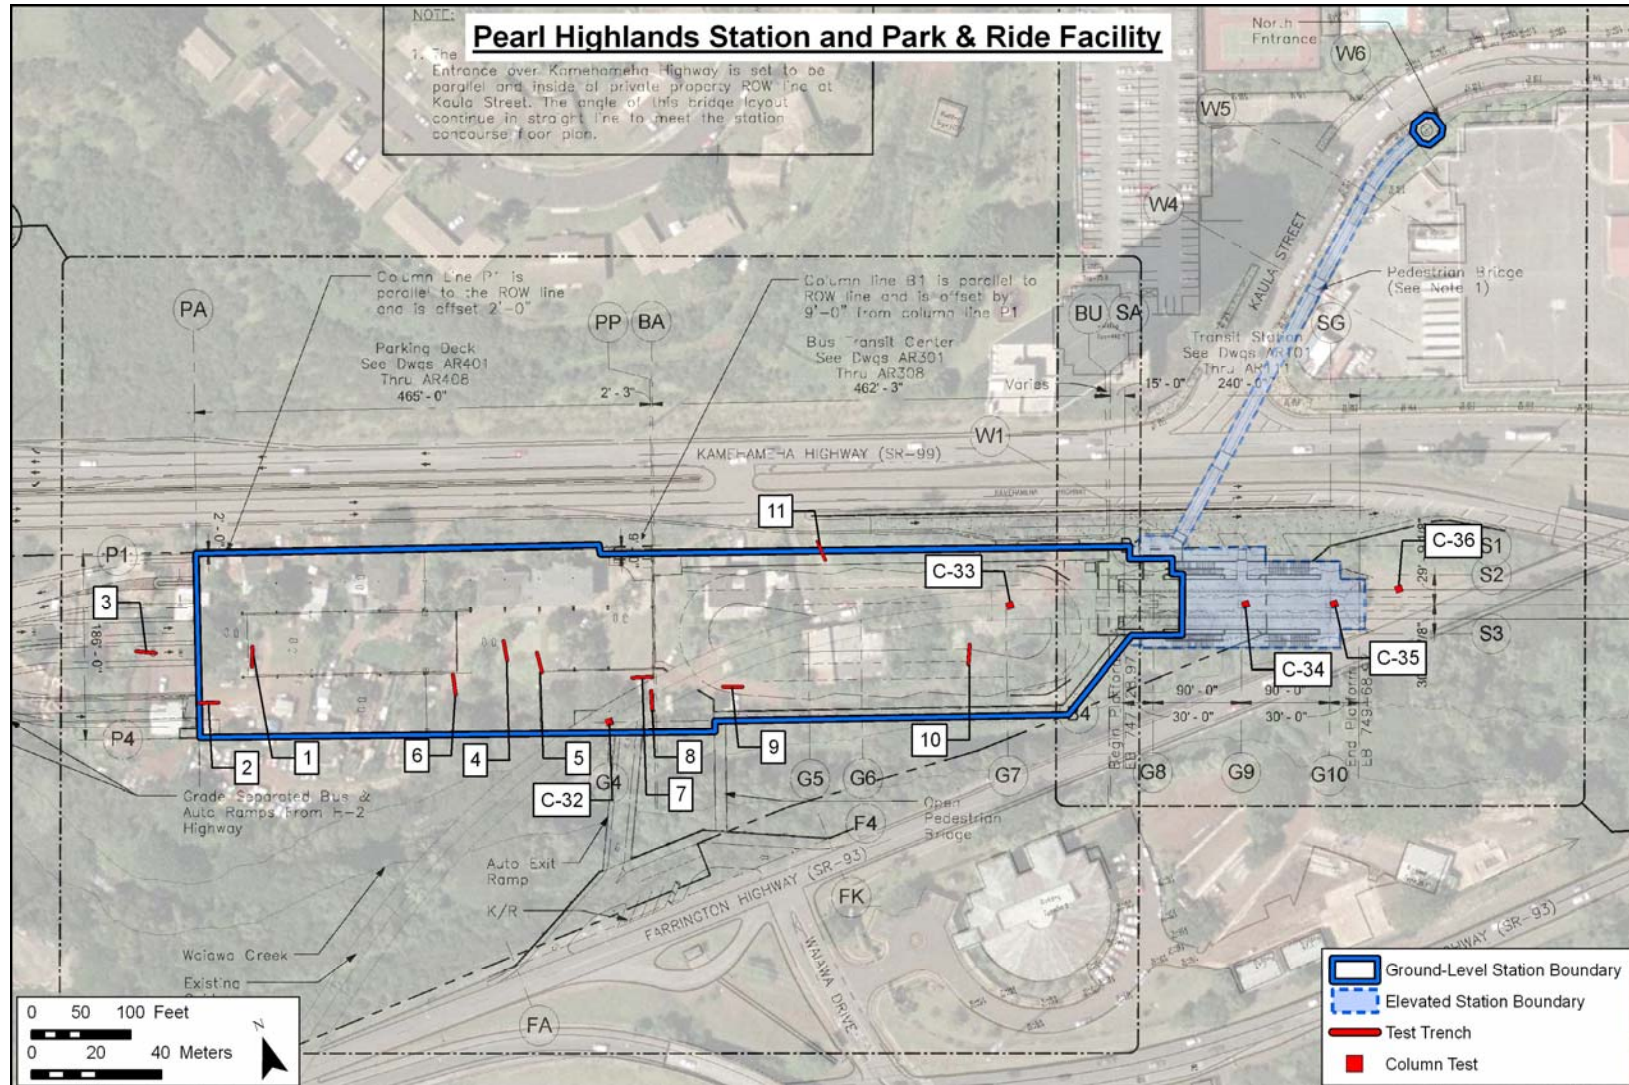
Pearl Highlands Station and Park and Ride Facility floor plan showing the location of test trenches
